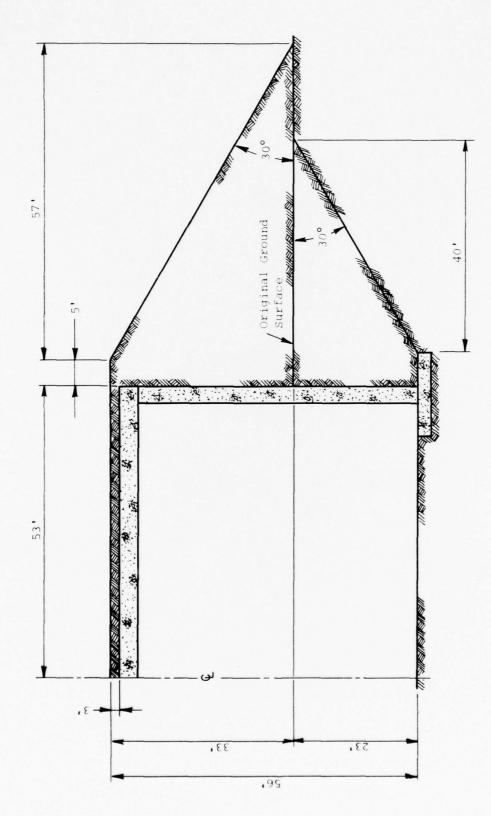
Aboveground Condition for 100-Foot Span Rectangular Section
